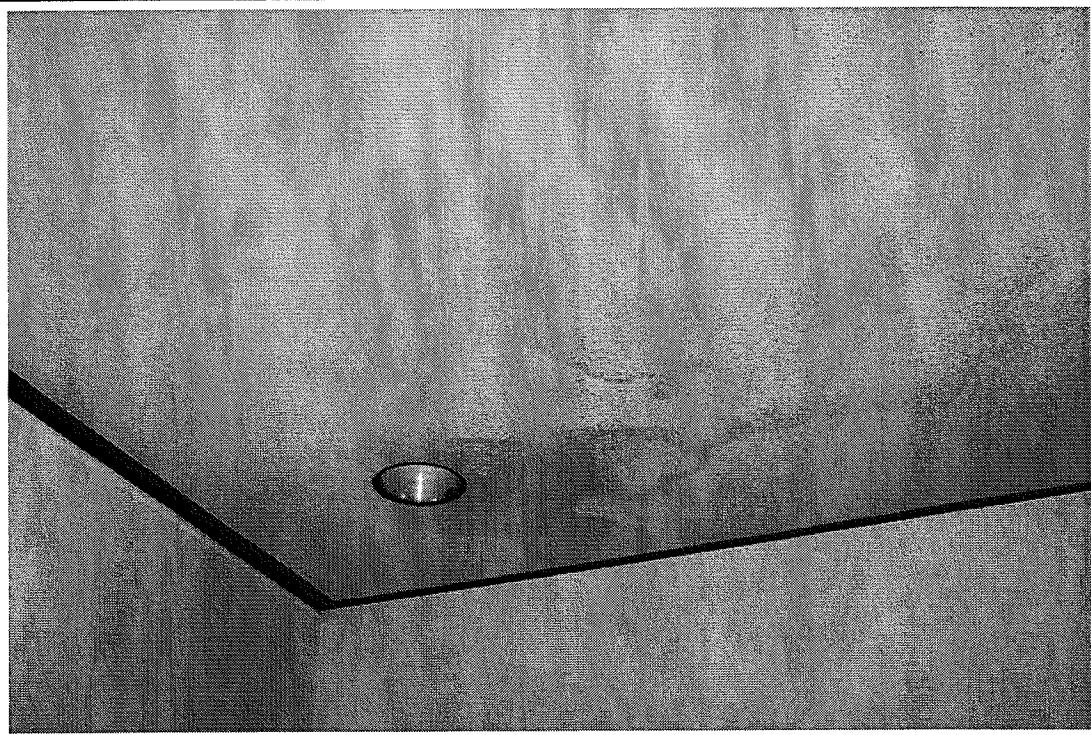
1st floor west office areas - General view of water damaged acoustical plaster next to light
